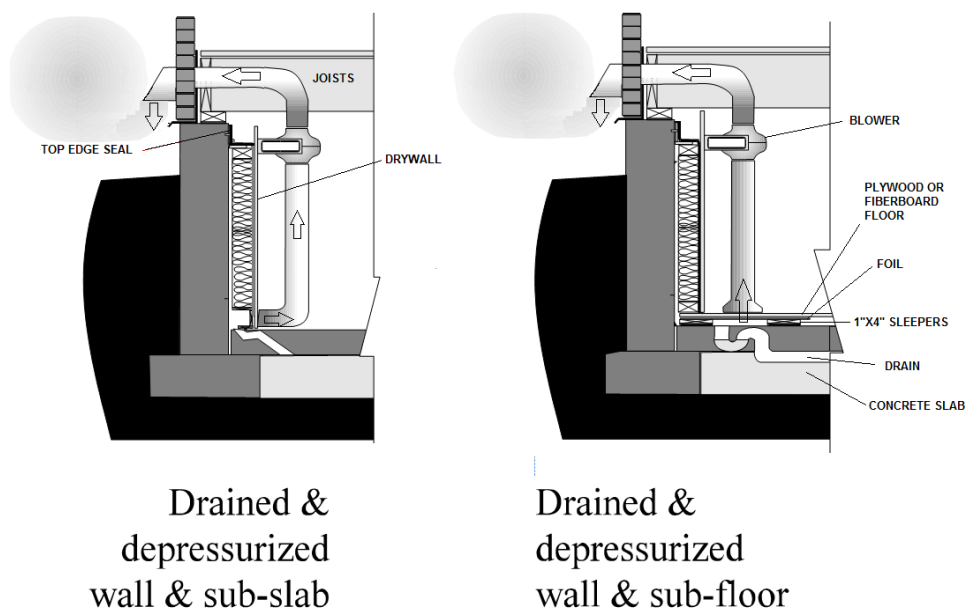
Main elements of depressurization system (a) wall only and (b) wall and floor
